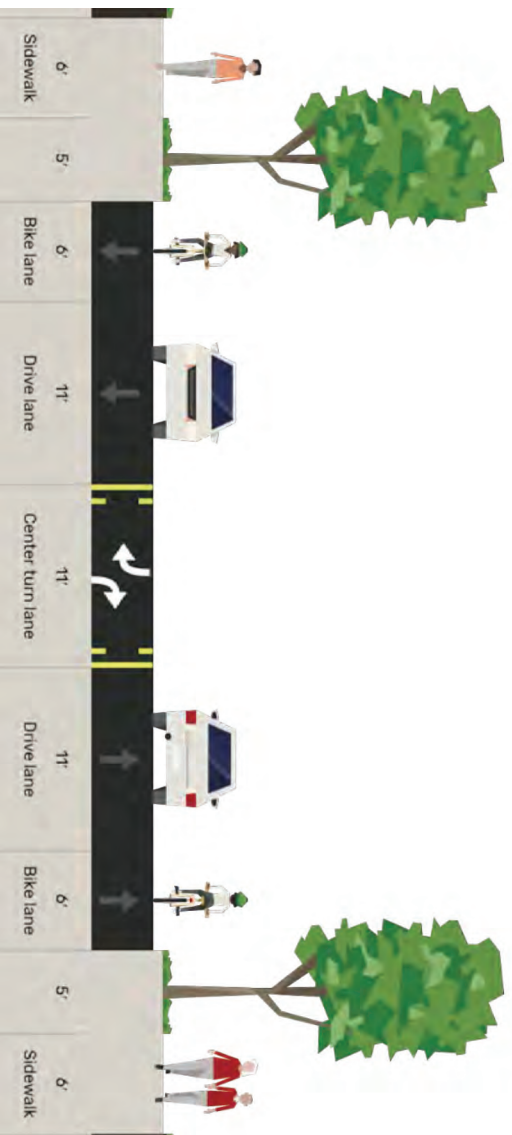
A: PROPOSED COLLECTOR – MIXED USE STREET CROSS-SECTION (SOURCE: STREETMIX)
